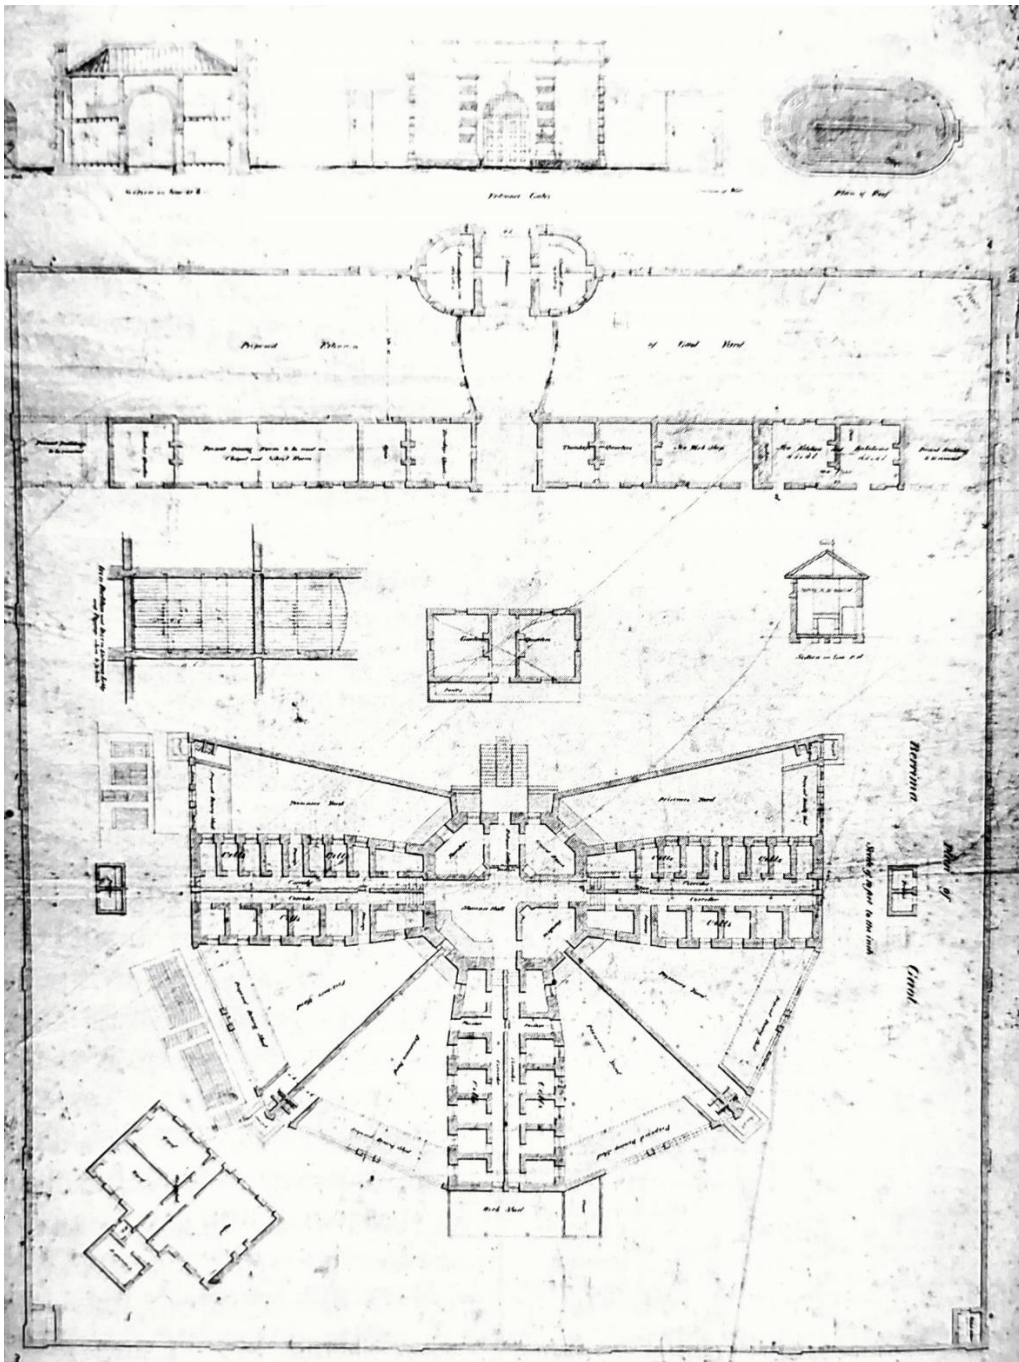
1862 plan from the Colonial Architect’s Office, outlining the proposed improvements at Berrima Gaol.
